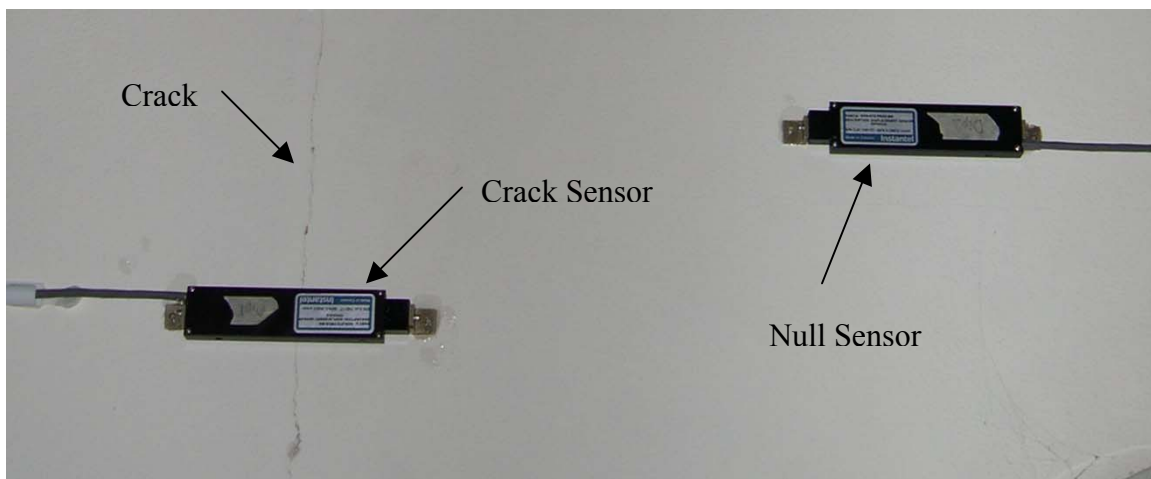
Installation of the system Y crack and null linear potentiometers on the cracked and uncracked drywall.
